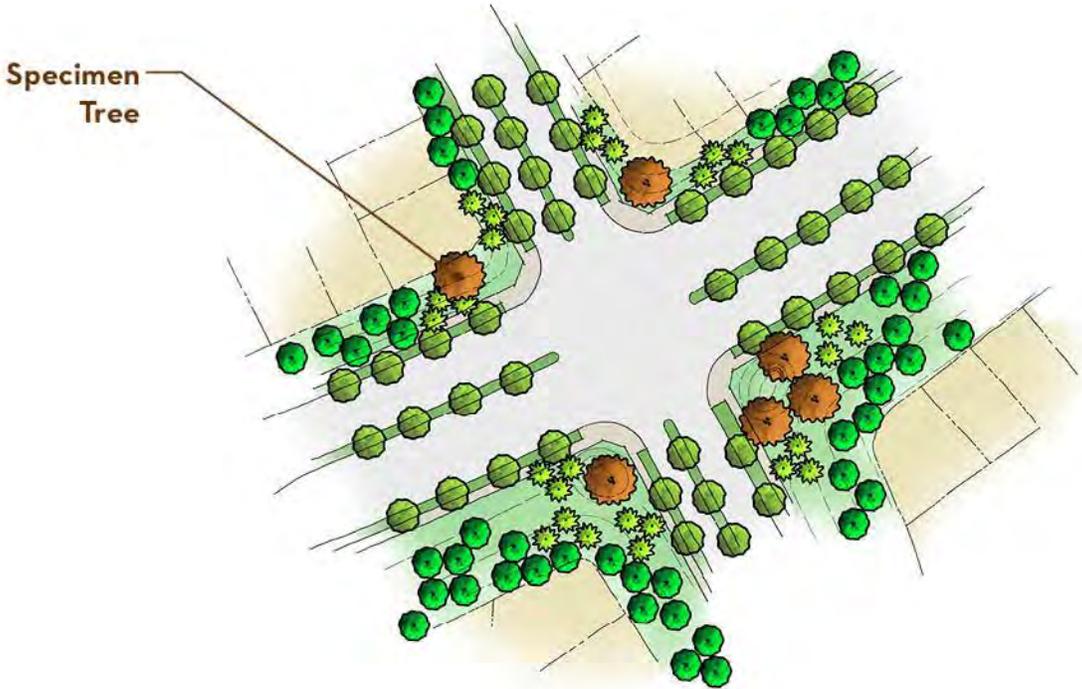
Community Arrival South - Concept Plan and Elevation
